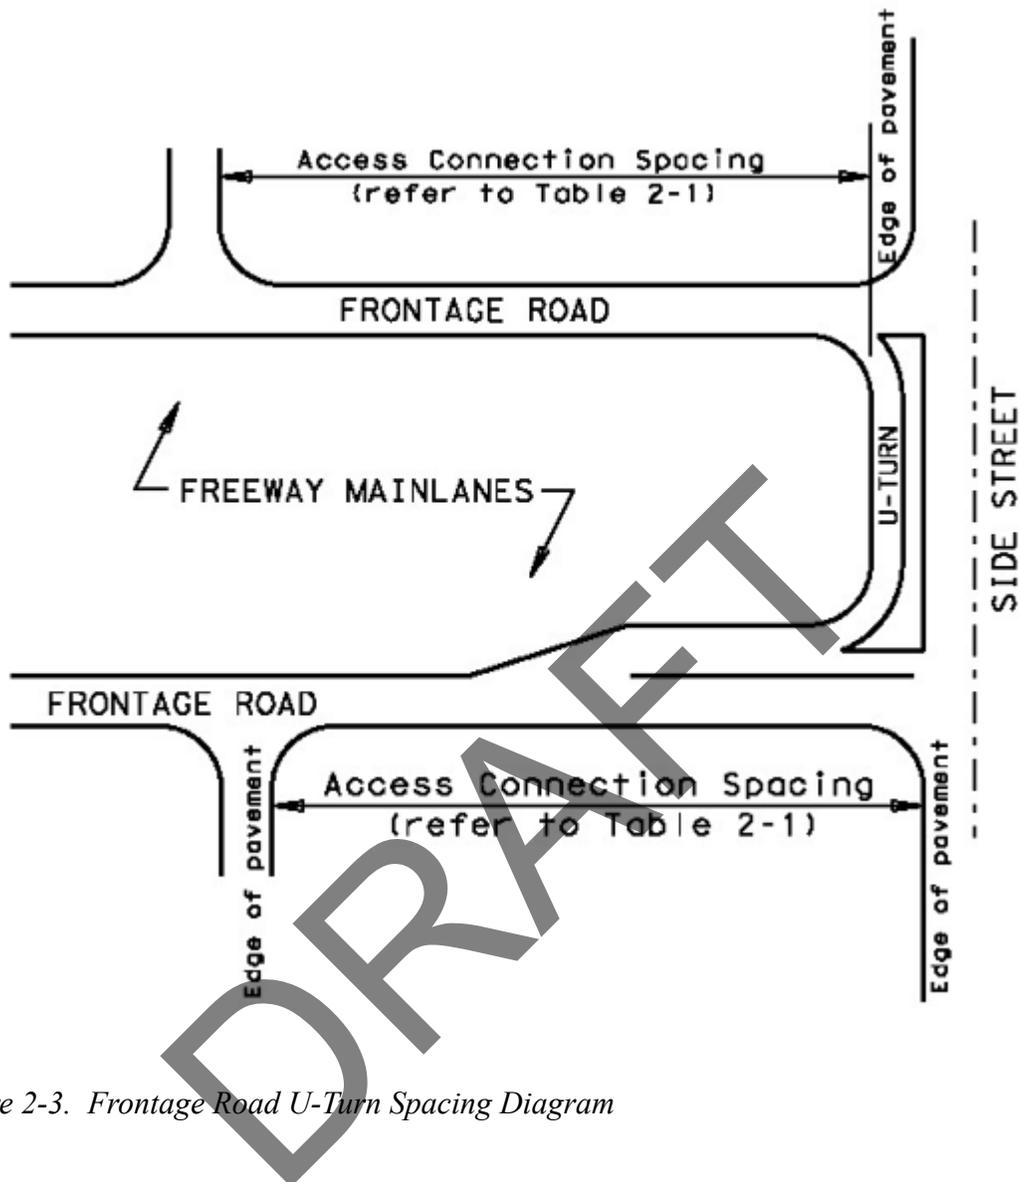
Frontage Road U-Turn Spacing Diagram
